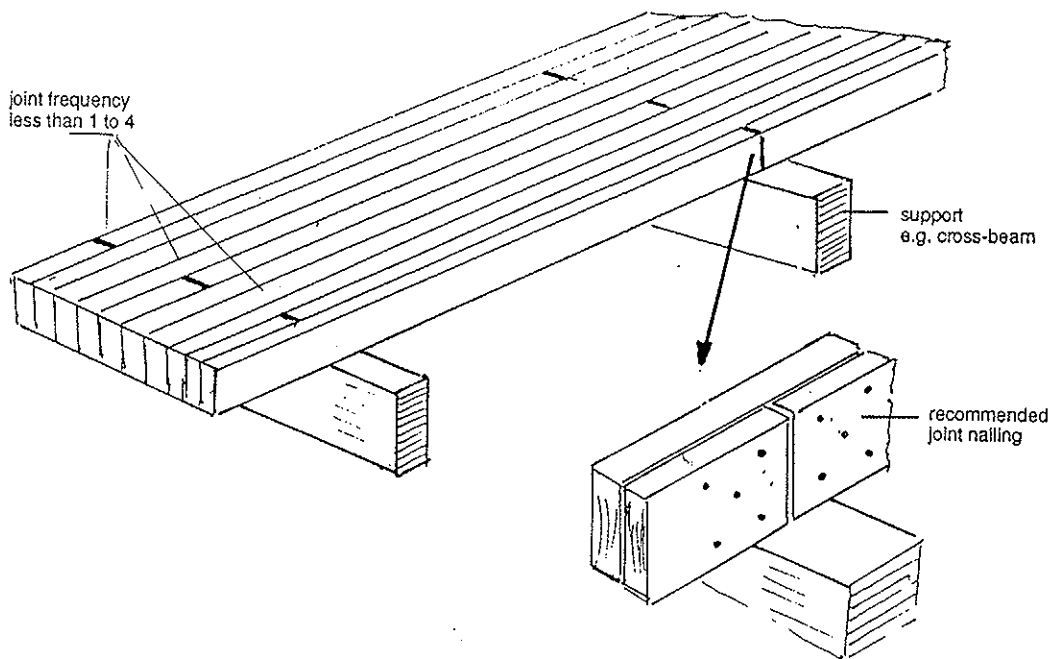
Example of butt-joint layout for road or railway bridge decks with a butt joint frequency of 1 in 4
